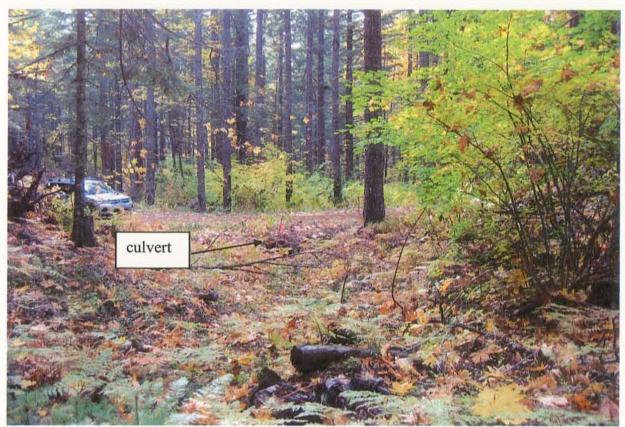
Looking south downslope approximately 100 feet above road. Culvert inlet is at pink flag. 10/26/06.
